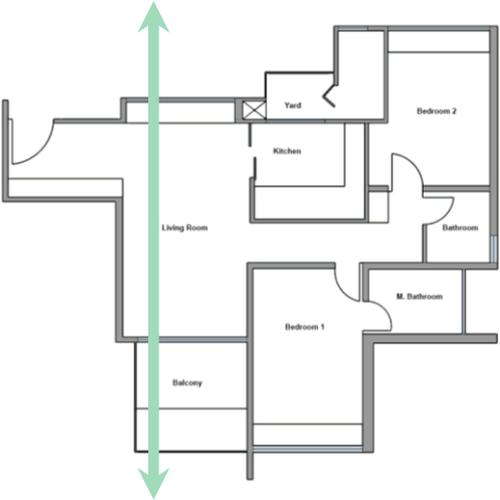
Dwelling unit layout showing Bedroom 2 with good cross ventilation and meet the requirement.
